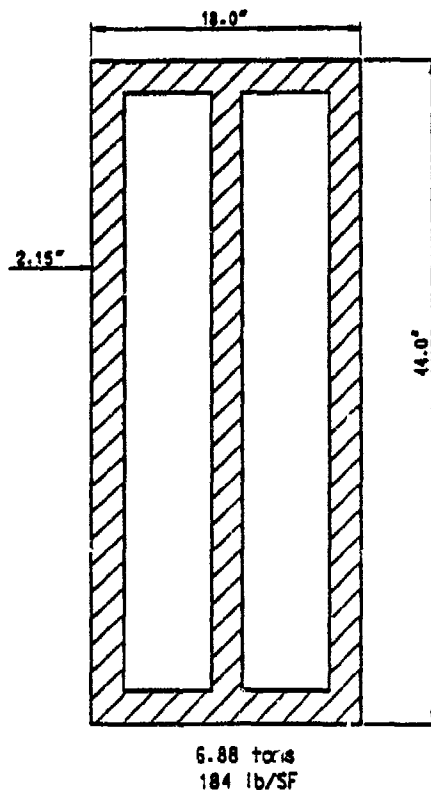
Pultruded Fiberglass Beam Designs for 50-Foot Roof Span.
